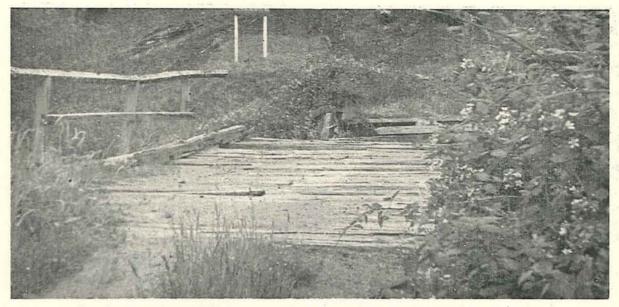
Old Timber Bridge on the Beech Forest-Apollo Bay Road over the Aire River.
